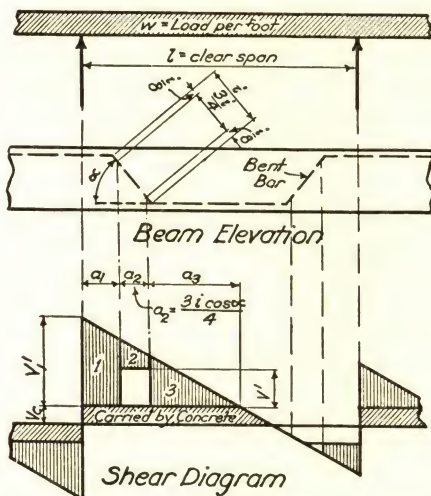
BENT-UP BARS IN CONJUNCTION WITH STIRRUPS.
